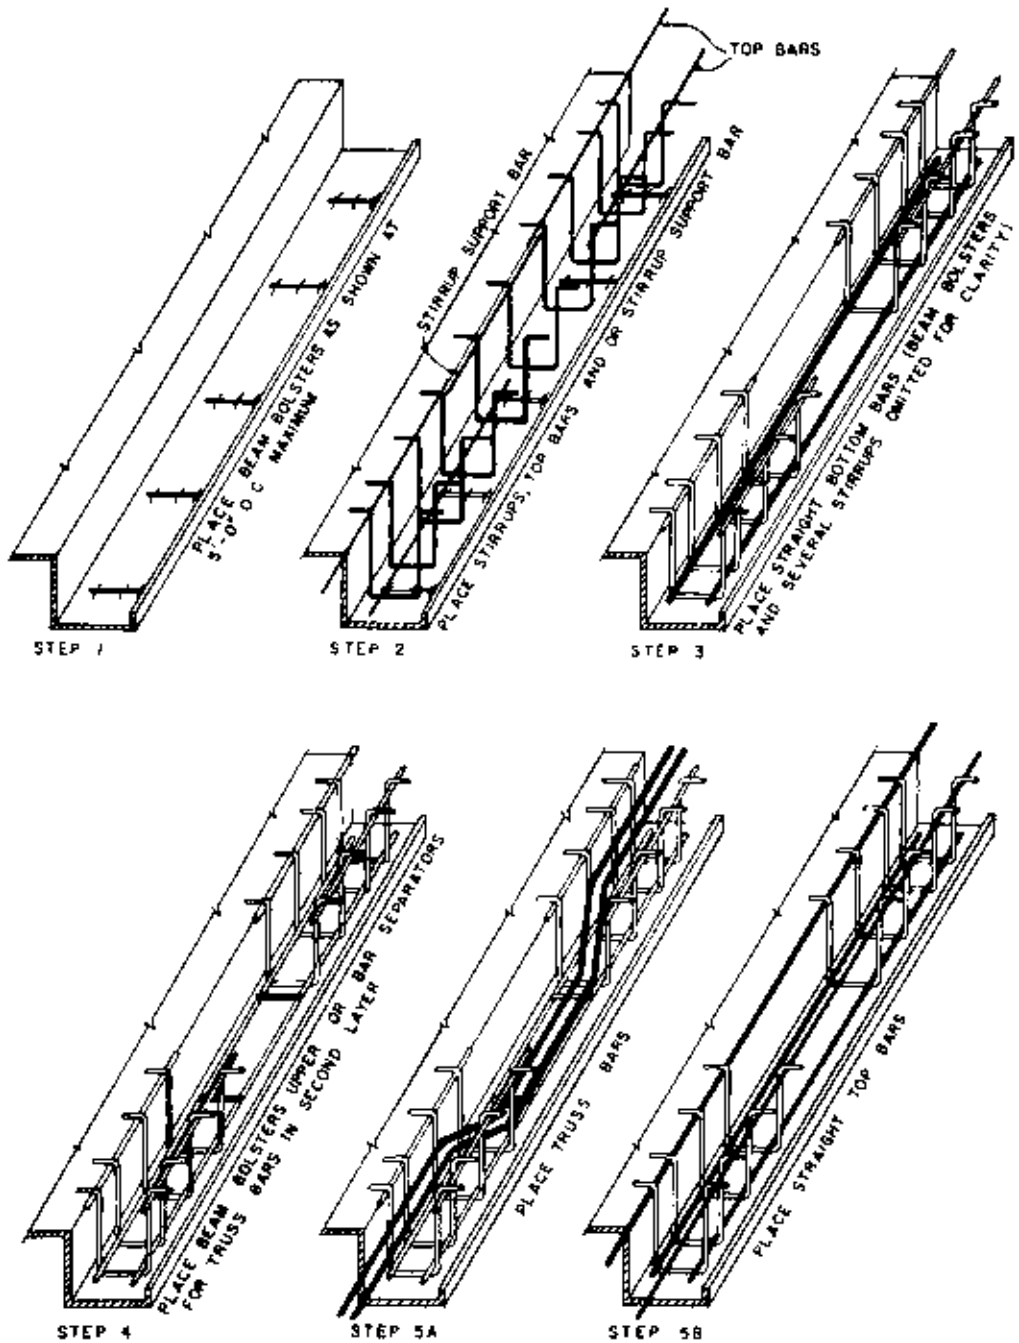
Placing reinforcing steel in a beam. (Courtesy of Concrete Reinforcing Steel Institute)
